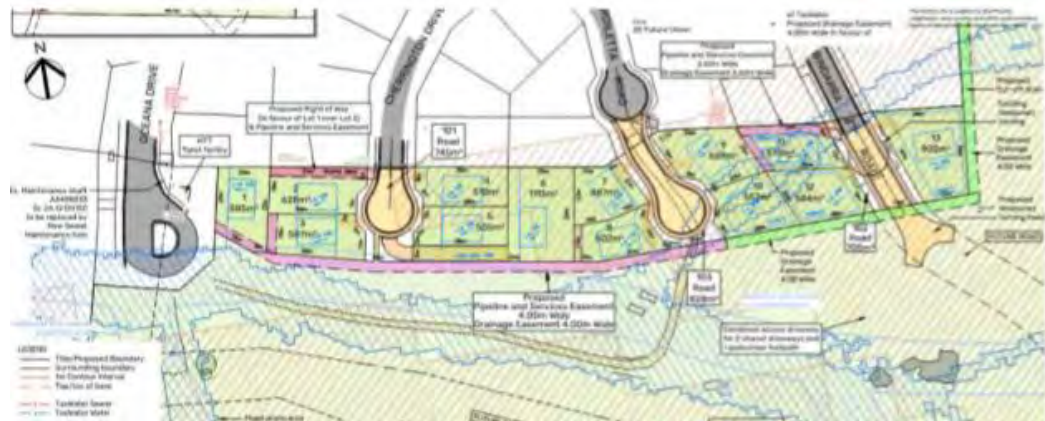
Image of proposed residential subdivision. (Source – MC Planners application)
